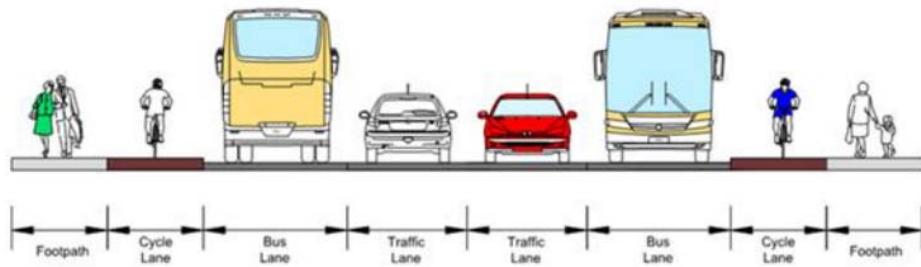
ABTA Cross Section for Eastern Gateway Bridge
